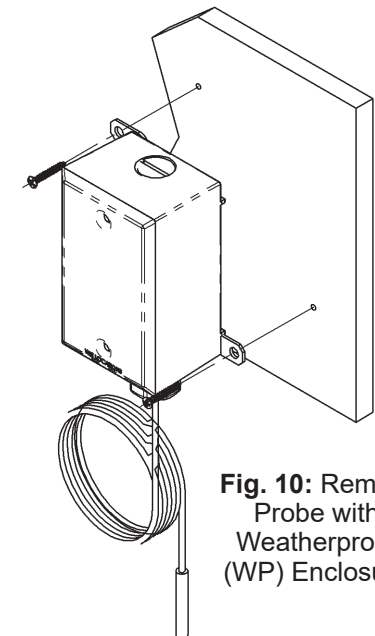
Remote Probe with Weatherproof (WP) Enclosure
